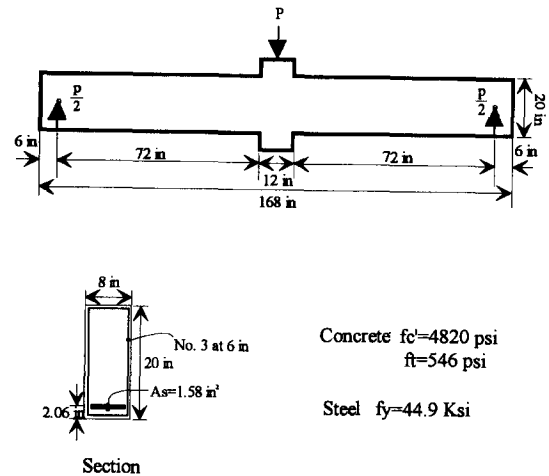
Schematic configuration of a reinforced concrete beam (Suidan and Schnobrich 1973).
